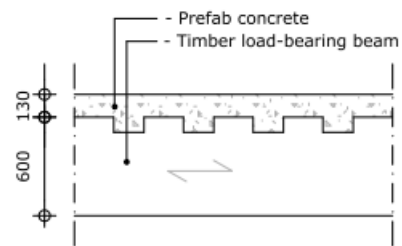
Lay-up floor system concept Pollmeier and TUMWood in mm
